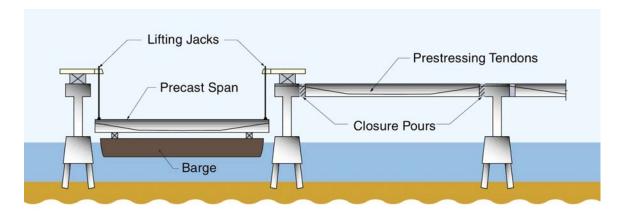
Post Tensioning with Heavy-Lift Construction
